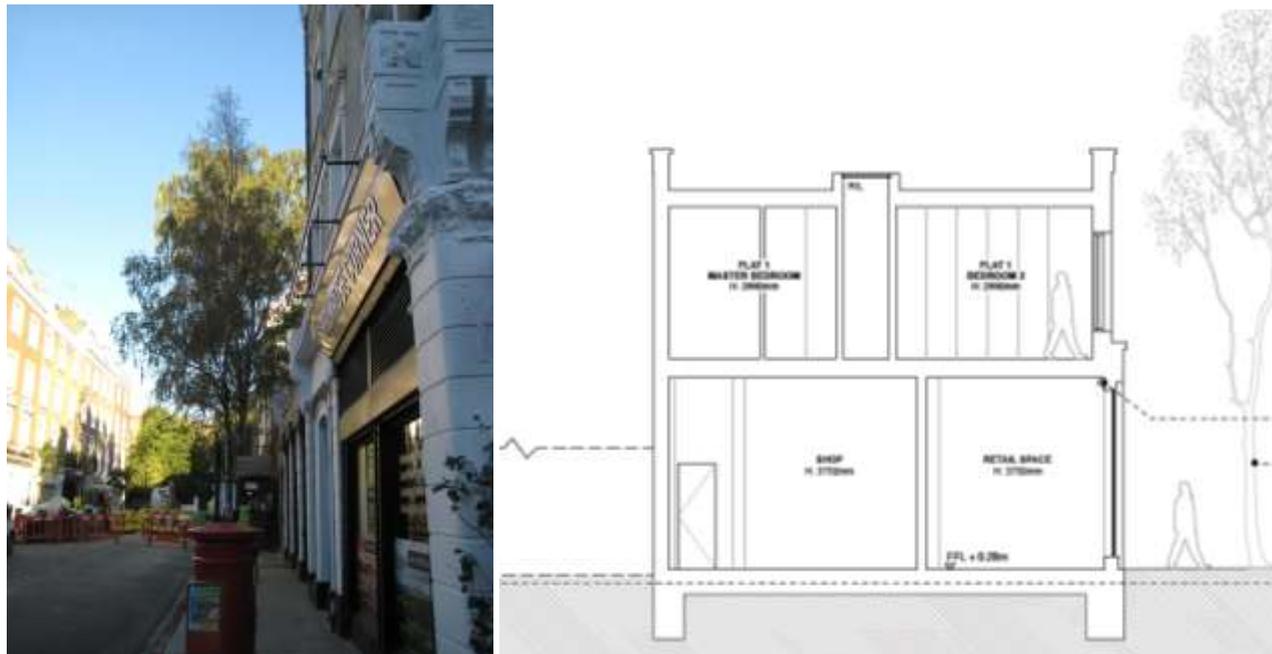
T1 (left) looking down Erskine Road with section showing slight step back of 1st floor level. Any pruning will be limited to minor canopy branches.
